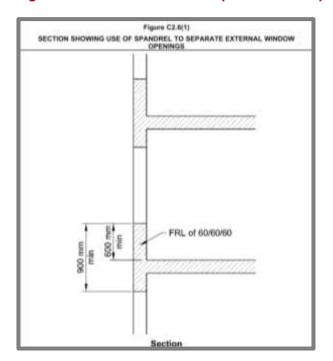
Clause C2.6 compliant vertical spandrel detail
